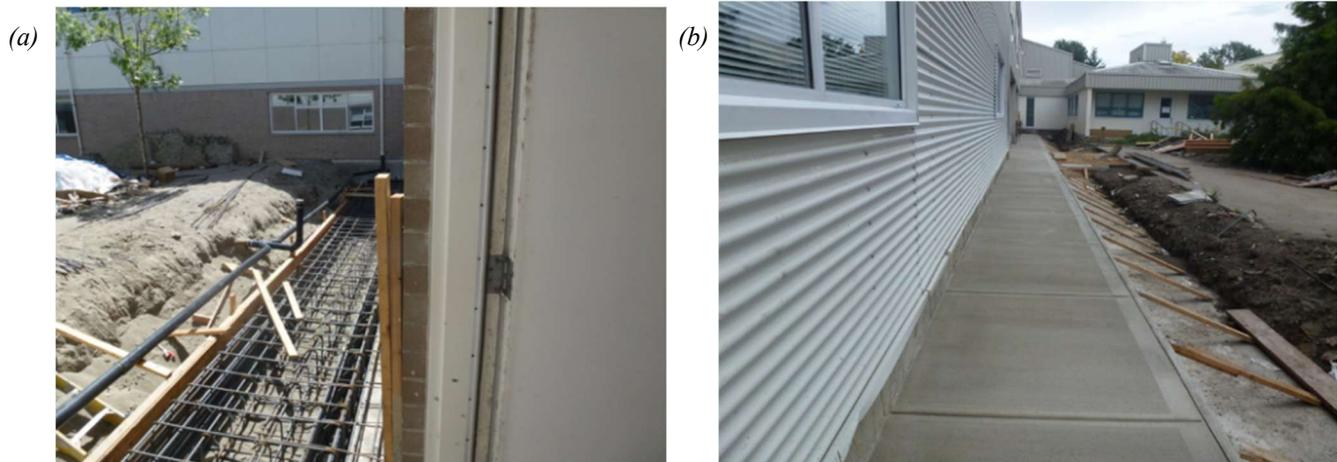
External Ring Beam (a) During Construction, (b) as Sidewalk When Completed
